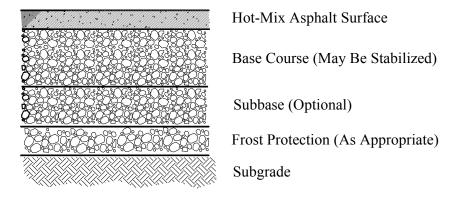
TYPICAL FLEXIBLE PAVEMENT STRUCTURE.
